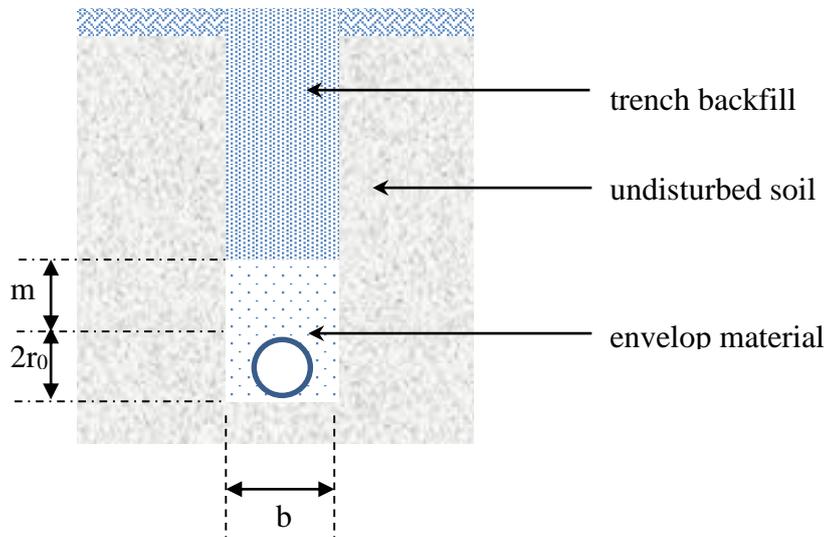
Drain pipe with gravel envelop in drain trench
